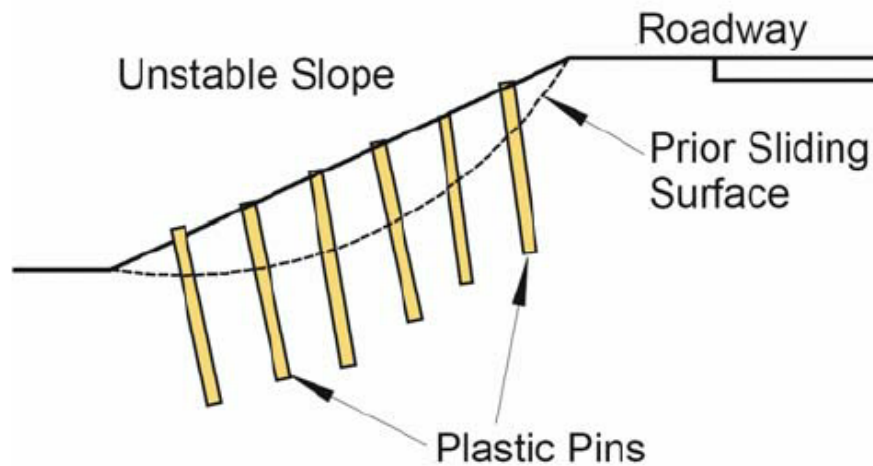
Stabilization of shallow slope failures using recycled plastic pins (Loehr et al. 2000).
